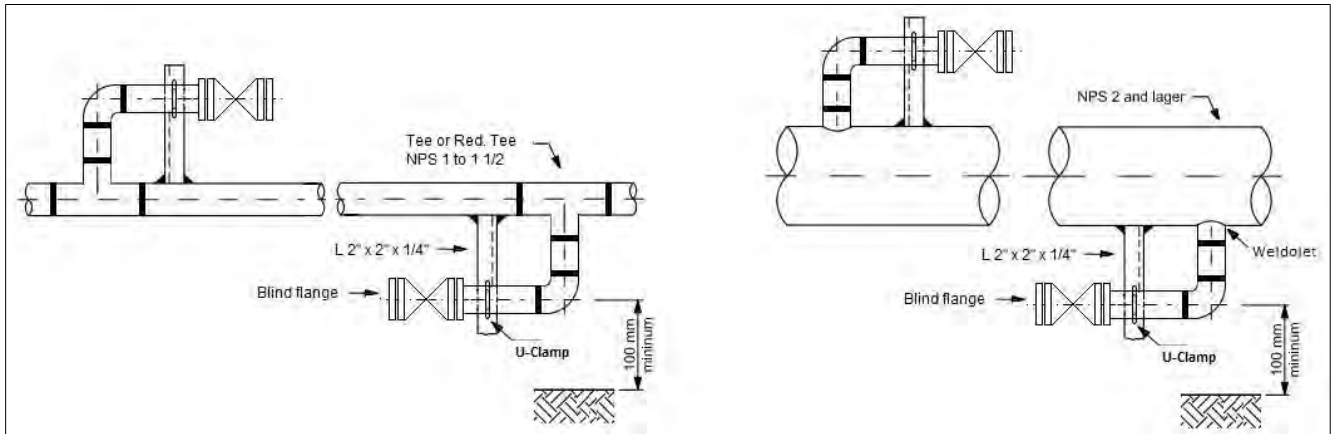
B - Drain & Vent single flanged valve with blind flange end for piping specs class 900 and higher. (note 3)
